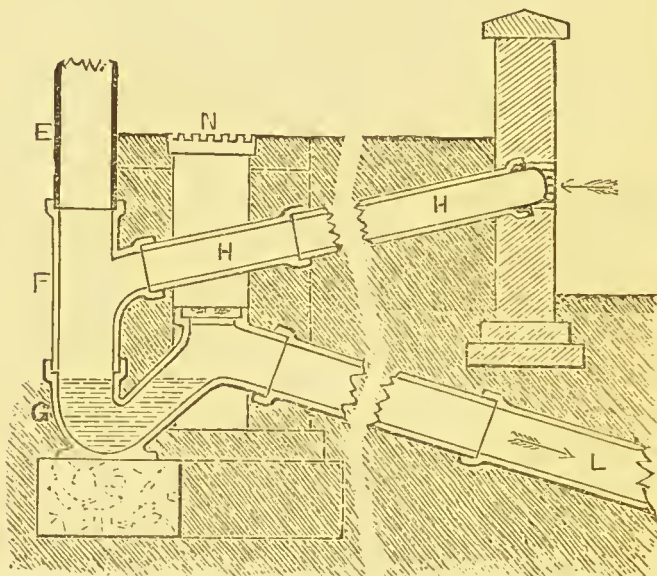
“Soil-pipe Trap,” with “Foot-ventilation.”
